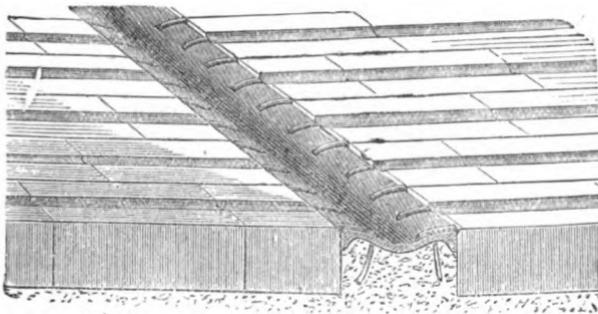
Floor laid with the Paving Brick shown in Fig. 88, and Iron Surface-drain.
